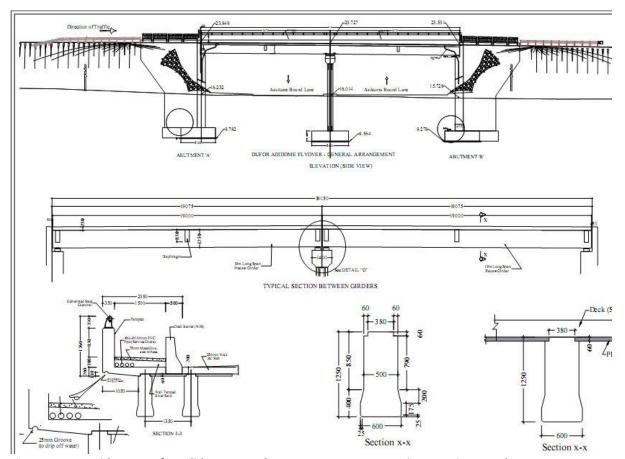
Bridge on Dufor Adidome Interchange CH. 29+350 on Section 3 Project Road
